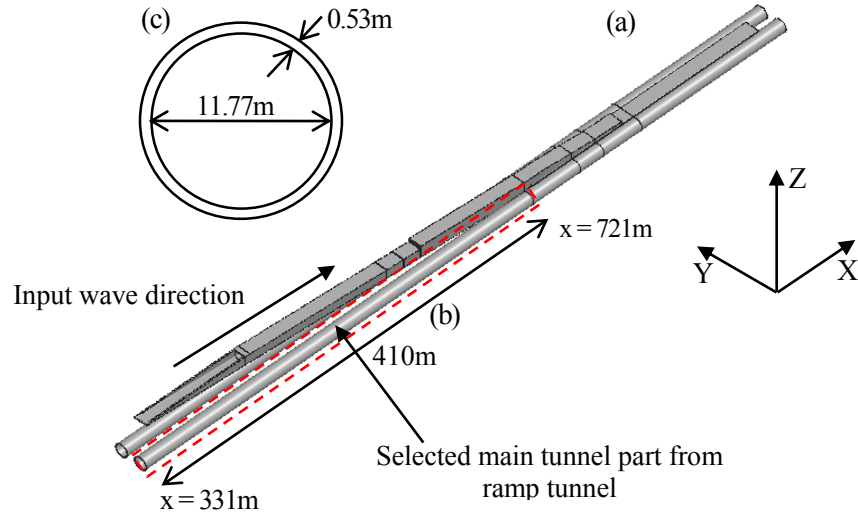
Ramp tunnel structure: (a) ramp tunnel; (b) selected main tunnel part; and (c) uniform cross-section of main tunnel.
